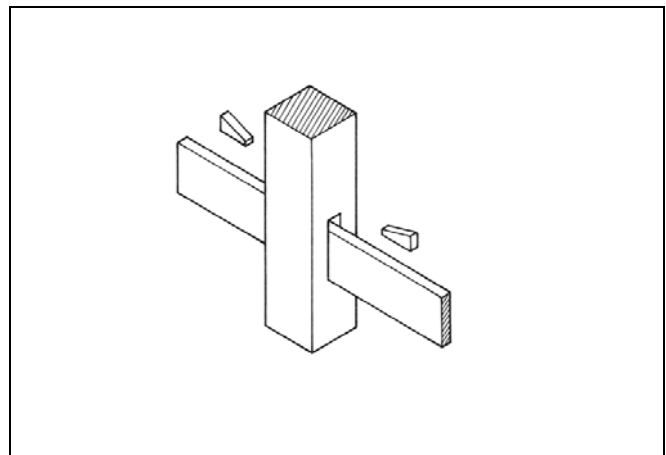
Traditional joint “column – girth” (source: Mokuzou kenchiki kenkyu forum, Encyclopedia of wood architecture, Gakugei shuppan, Kyoto, 1995).
